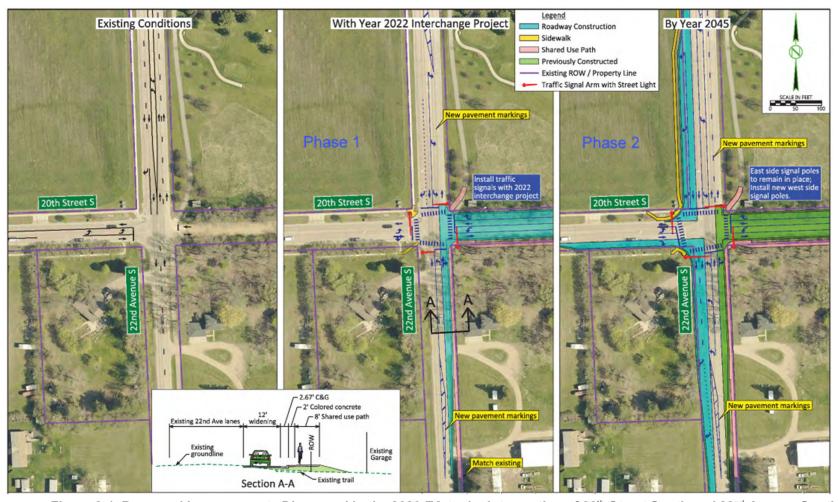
Proposed Improvements Discussed in the 2020 EA to the Intersection of 20th Street South and 22nd Avenue South
